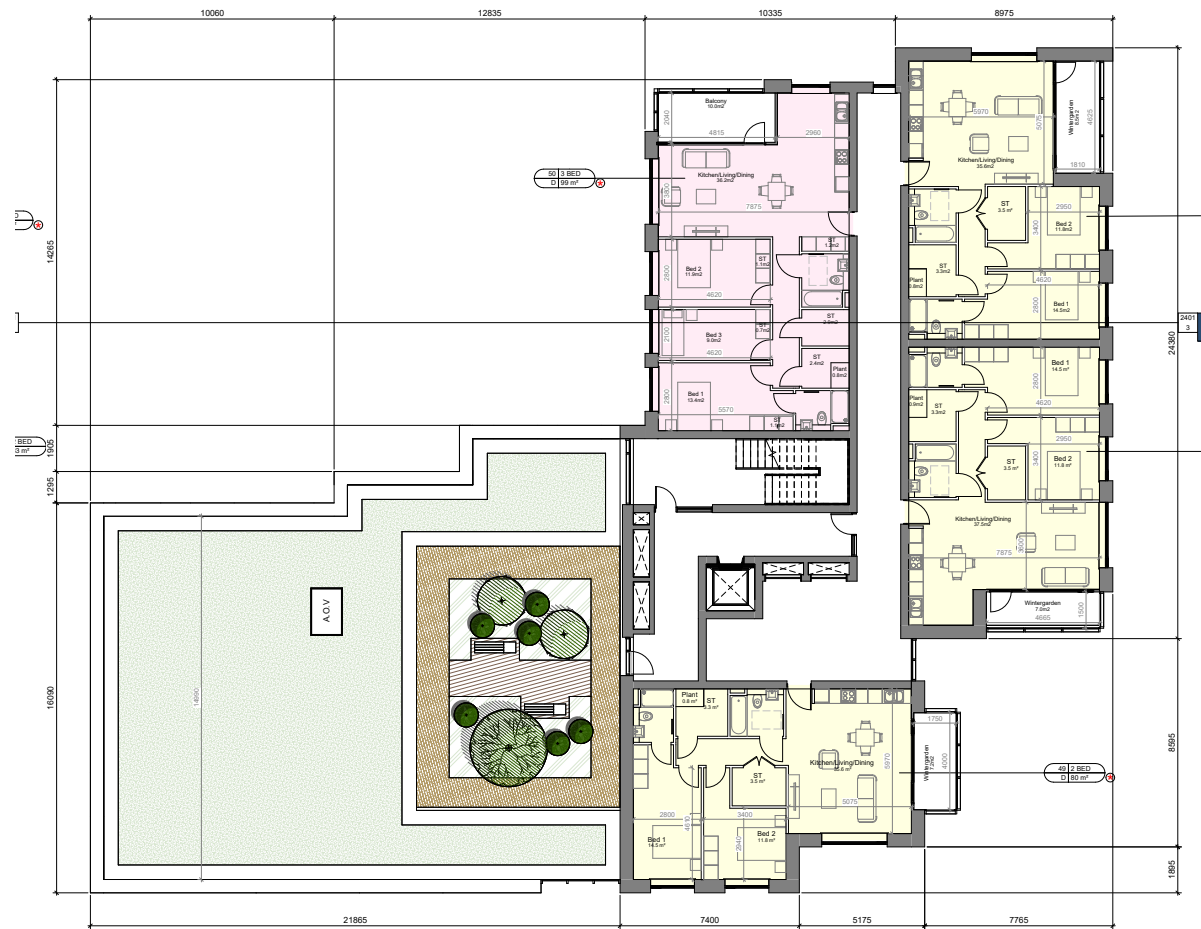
Block D- Sixth Floor Plan Source: MCORM, 2026.
